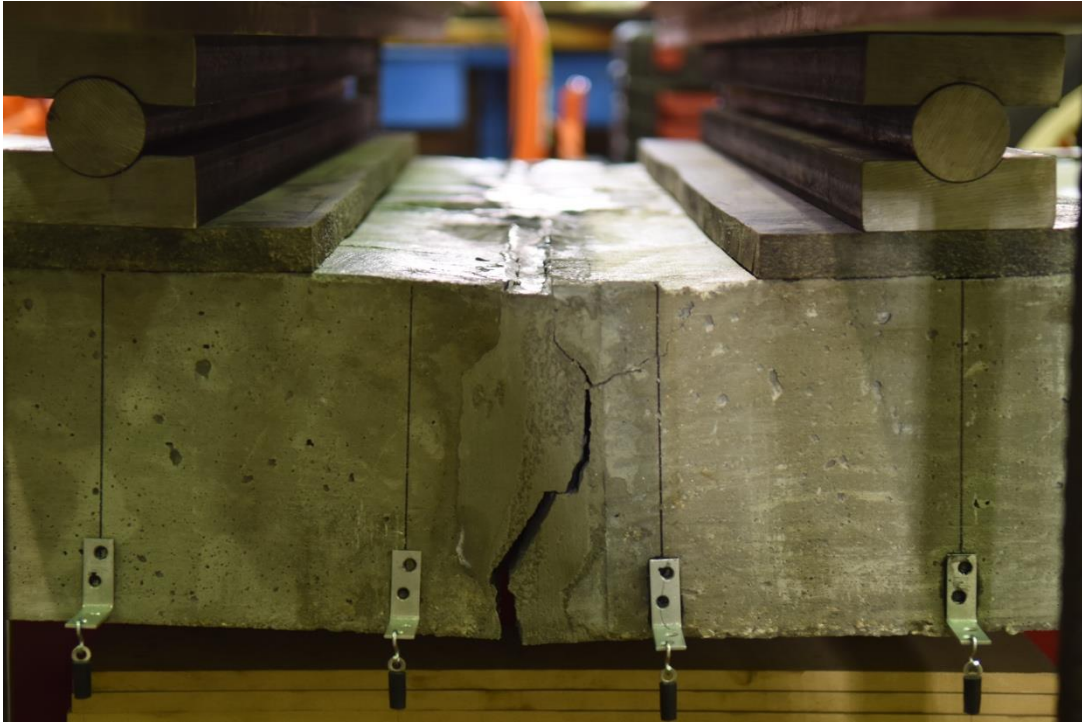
Crack Propagation through the Grout (Specimen C-C-1)
